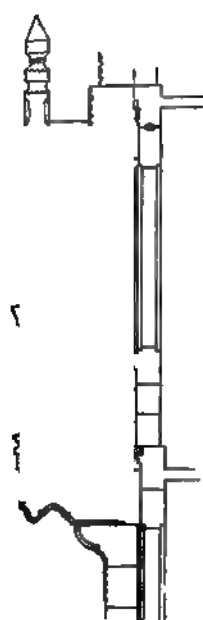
SECTION OF BALCONY—GRINDELWALD.
